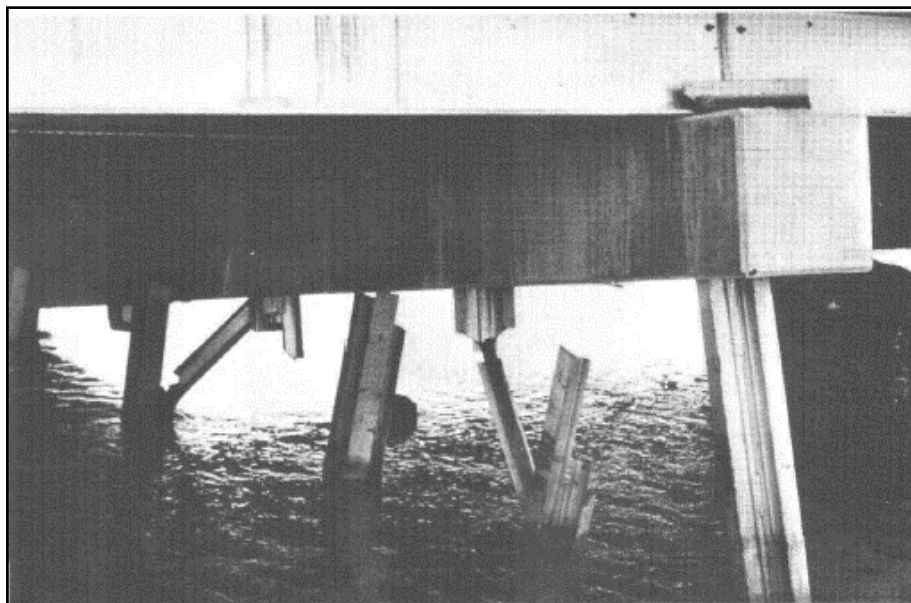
Sheared Rail Piles on Scott Glacier Bridge 6, (Kachadoorian, 1968)
